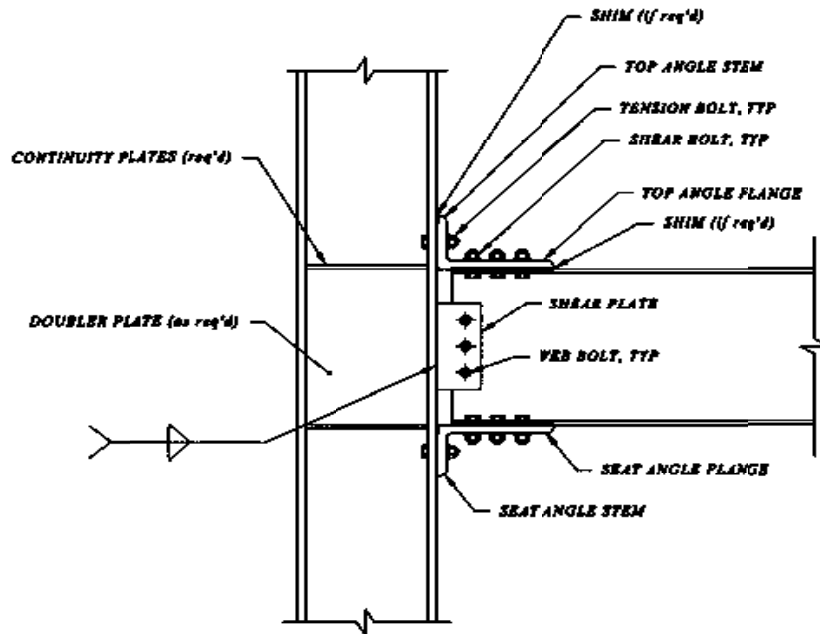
Typical Top and Seat Angle Type Connection (Pirmoz et al. 2008)
